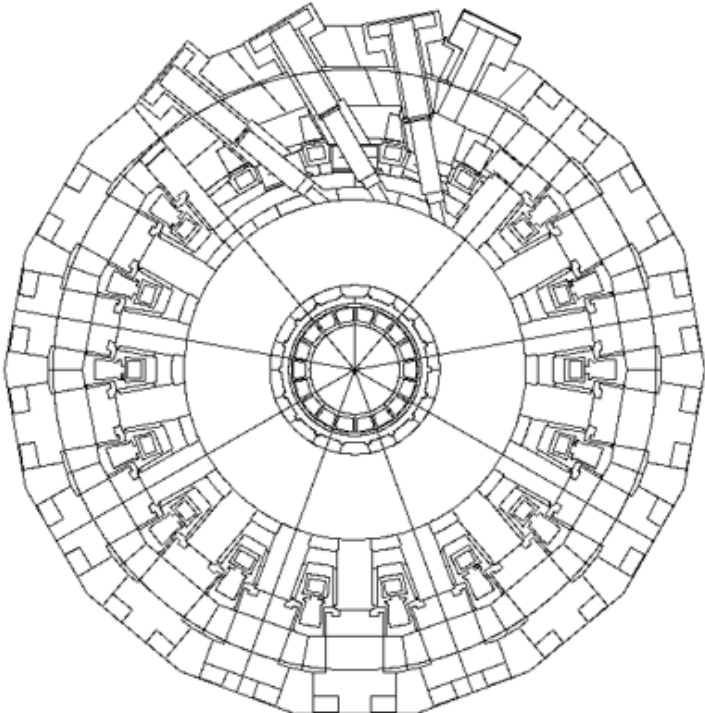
Horizontal cross-section of the E-lite block structure (L1 level).
